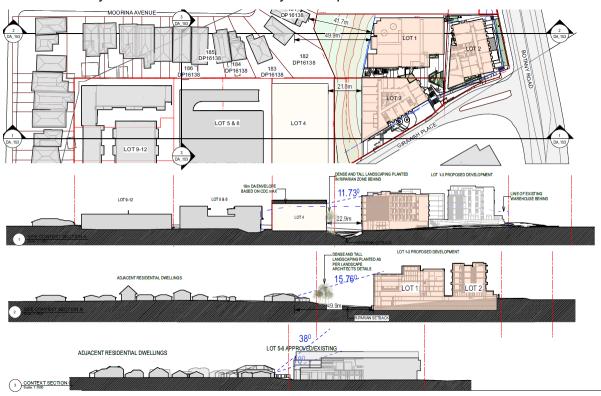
Site Context Sections (Source: Drawing No. DA\_153 – Bennett Murada Architects)
